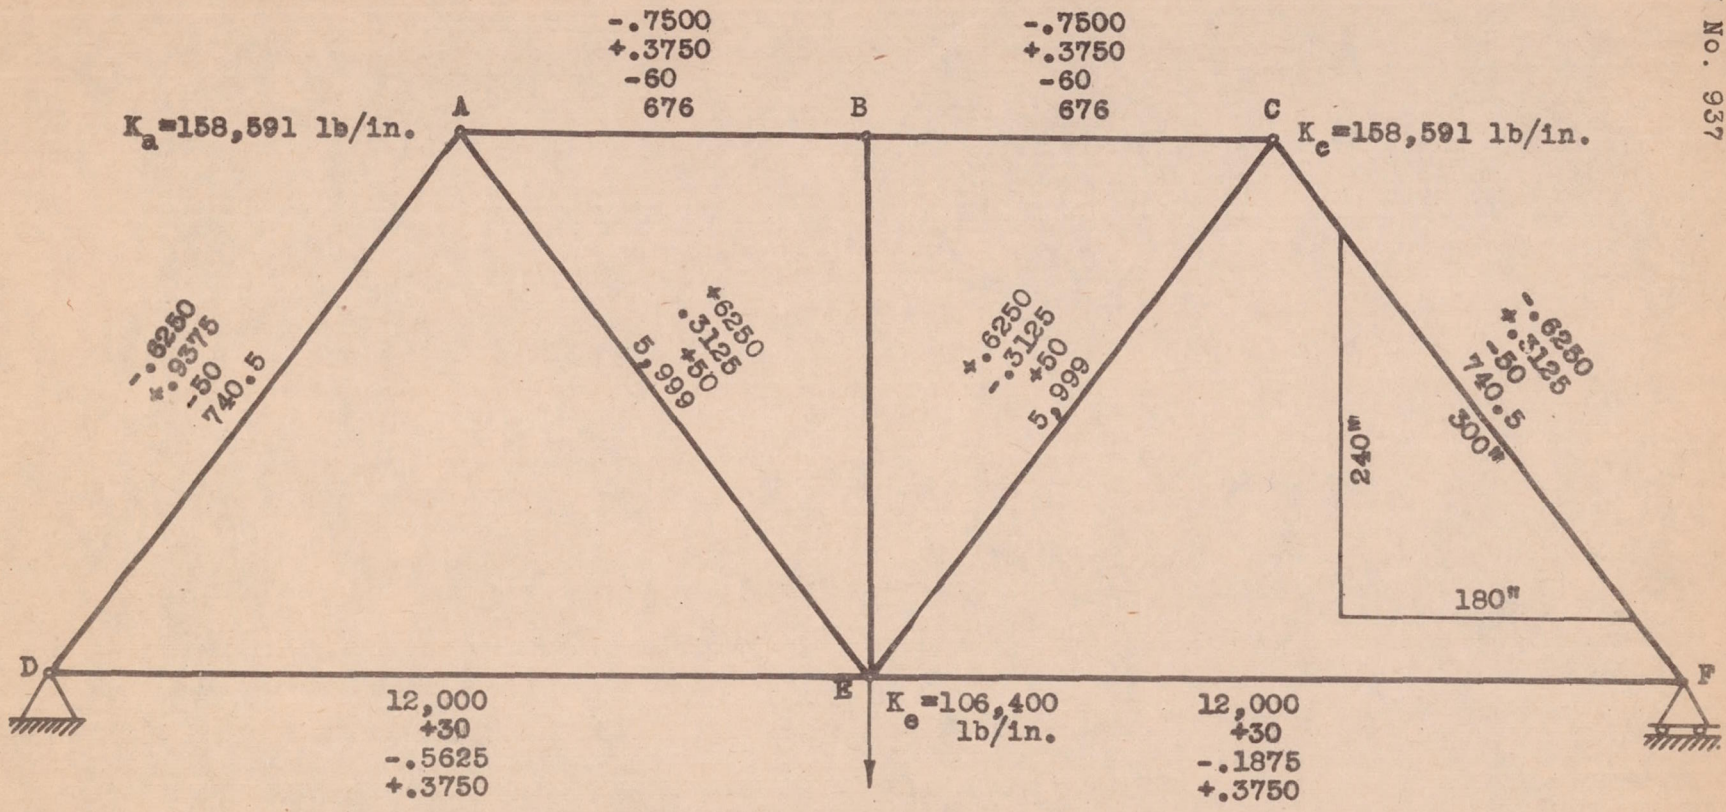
Extensibilities and unit load systems for truss of figure 8.
